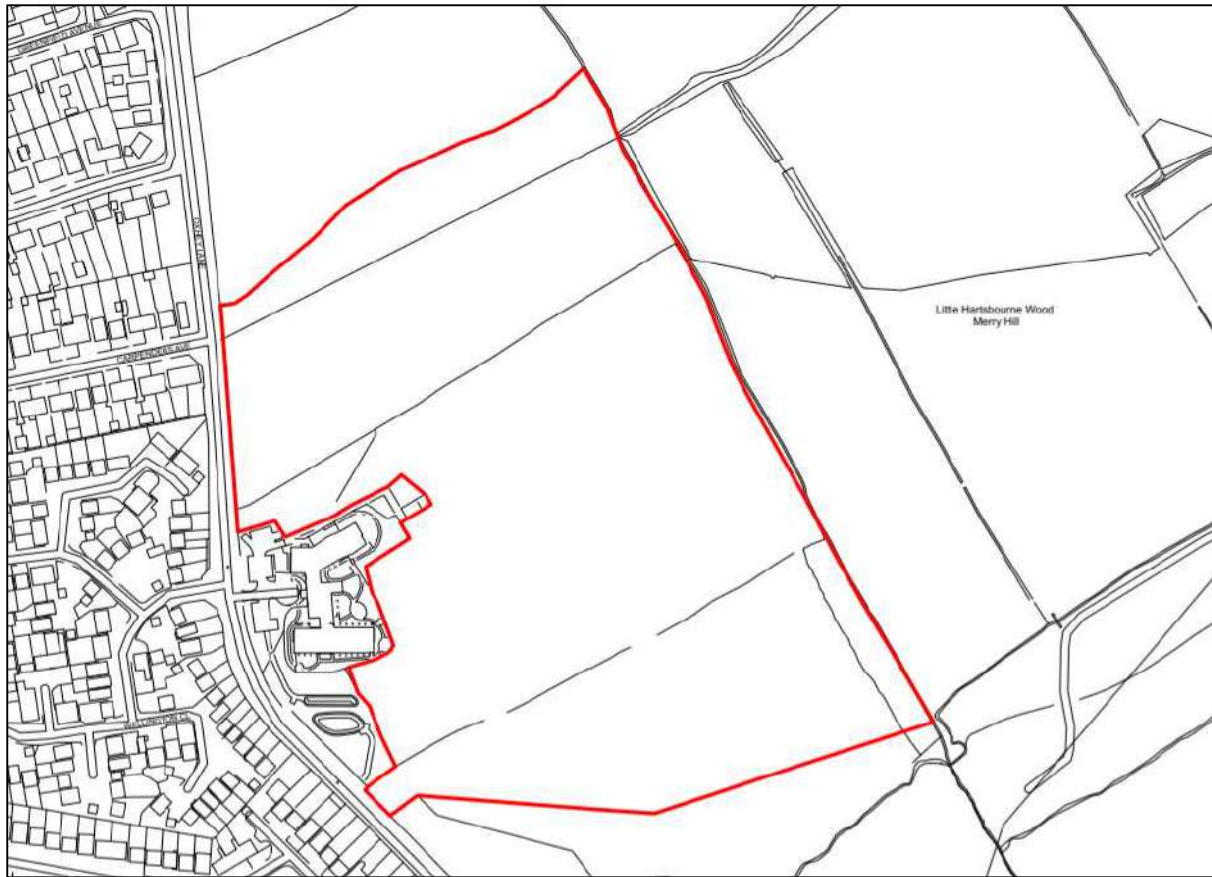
Site Location Plan (Source: Pegasus Group)
